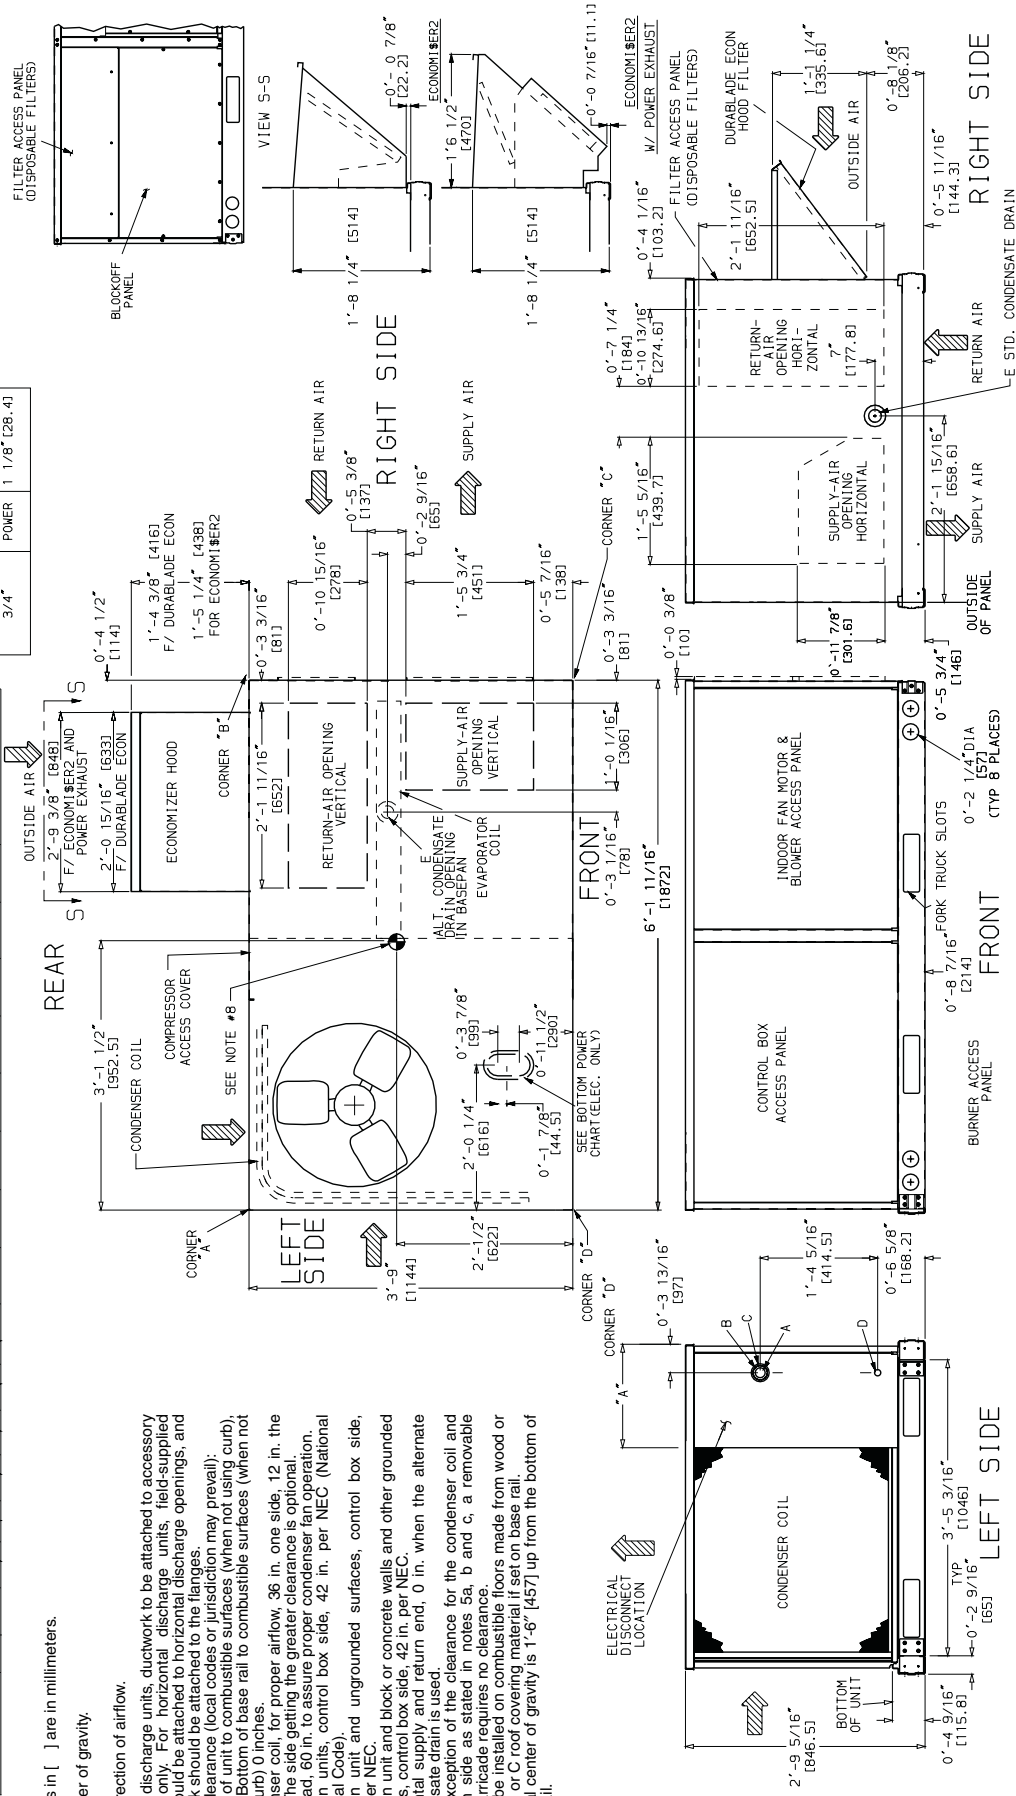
A — Base Unit Dimensions — 50TFF004-007 and 50TM004-006 Units
